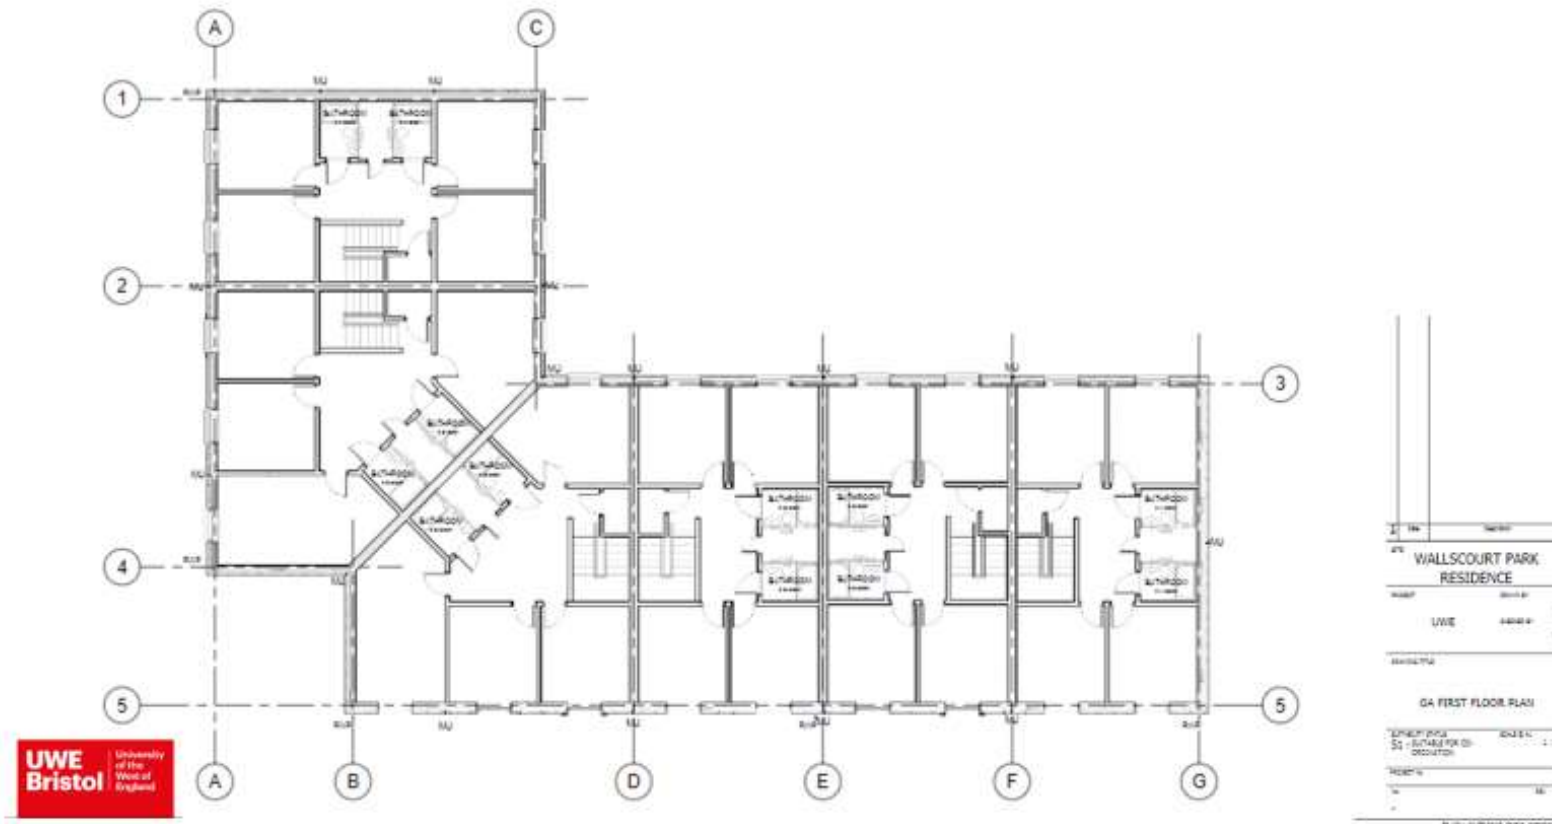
Plan of layout for houses A to F, first floor bedrooms and shower rooms (source: UWE)
